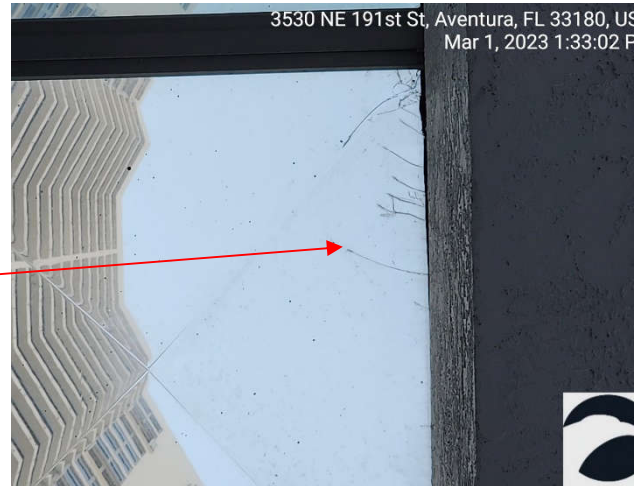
Cracked panel at skylight system (Lower Roof)
